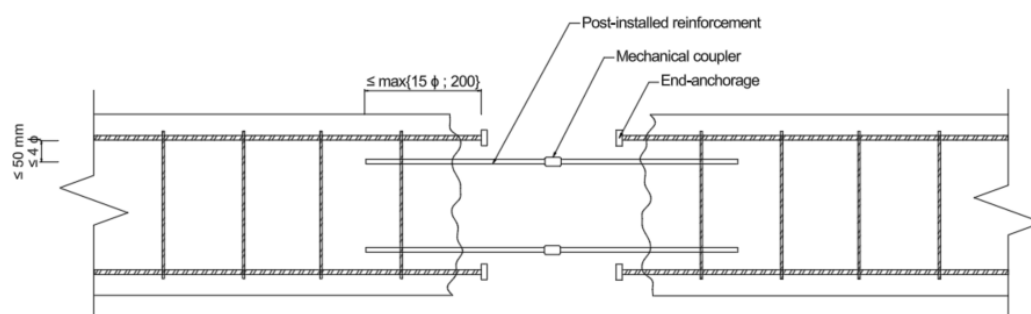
Reinforcement reconnecting proposal with post-installed reinforcement
